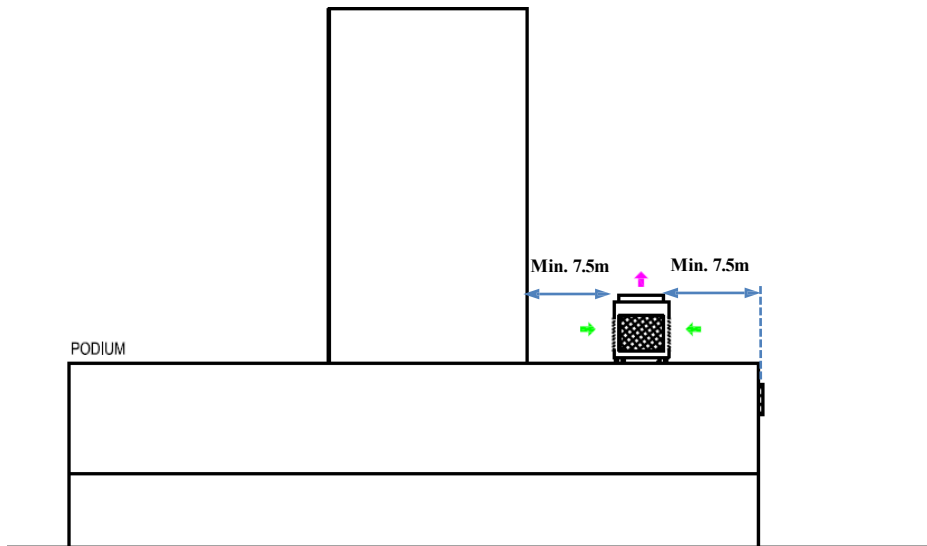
Cooling tower installed on podium within minimum 7.5m horizontal separation from its own building façade boundary/building tower above the podium. No public access is allowed for area within horizontal 7.5m from the cooling tower.
